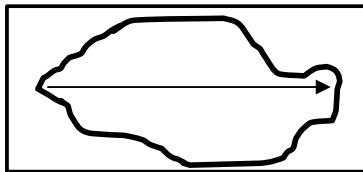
Longitudinal section of rebar. Illustration of determination of (maximum) pit length
